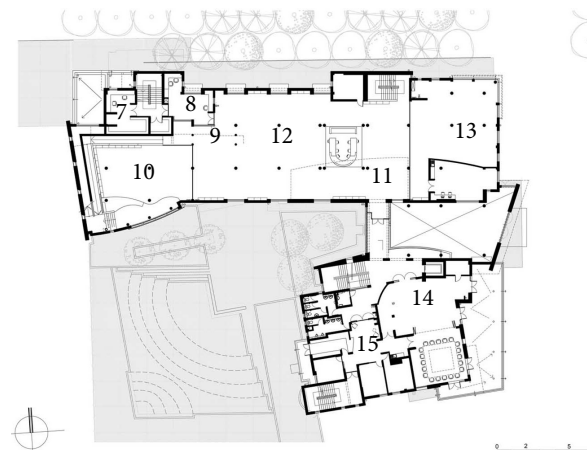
Kuyasa, First floor plan (www.CCNI.co.za)
